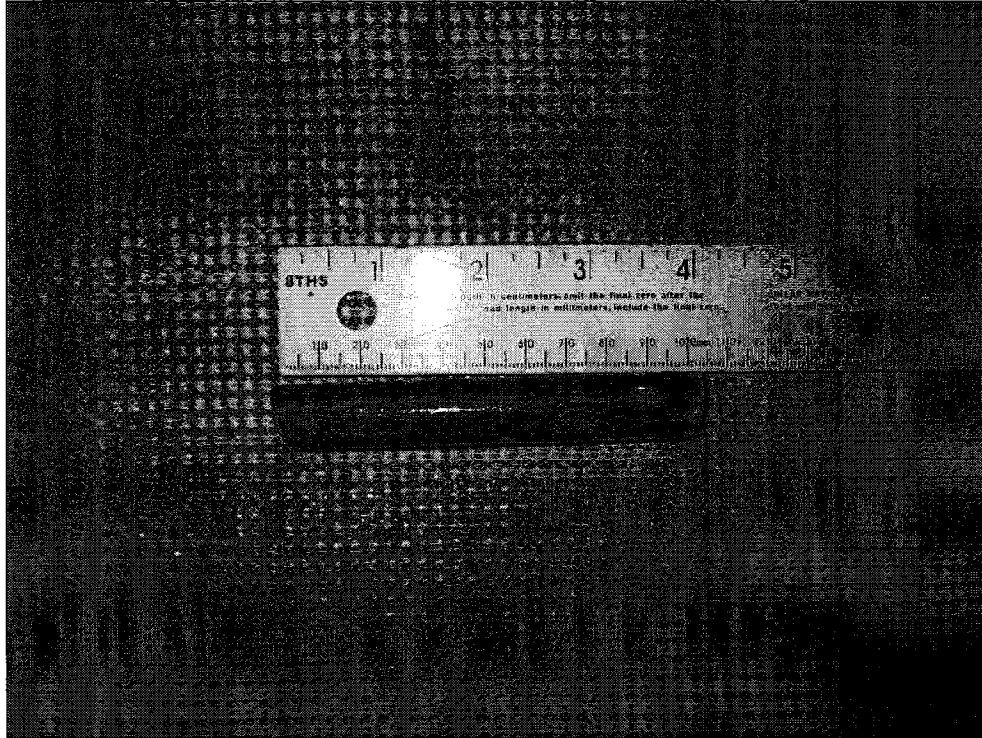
Rebar Sample S1 (West Abutment, 15M, vertical)
